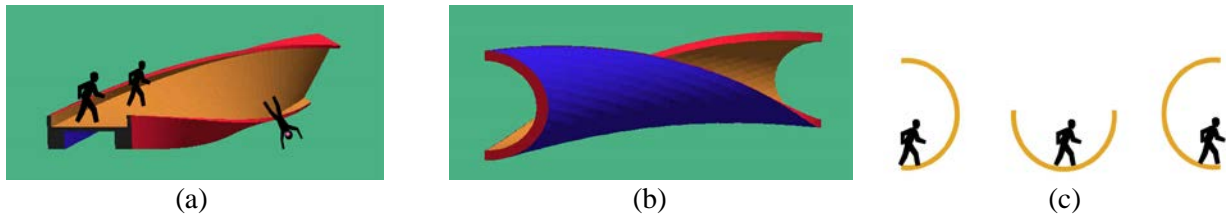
(a) A twisted walkway, (b) concave cross section that accommodates some roll (c).
